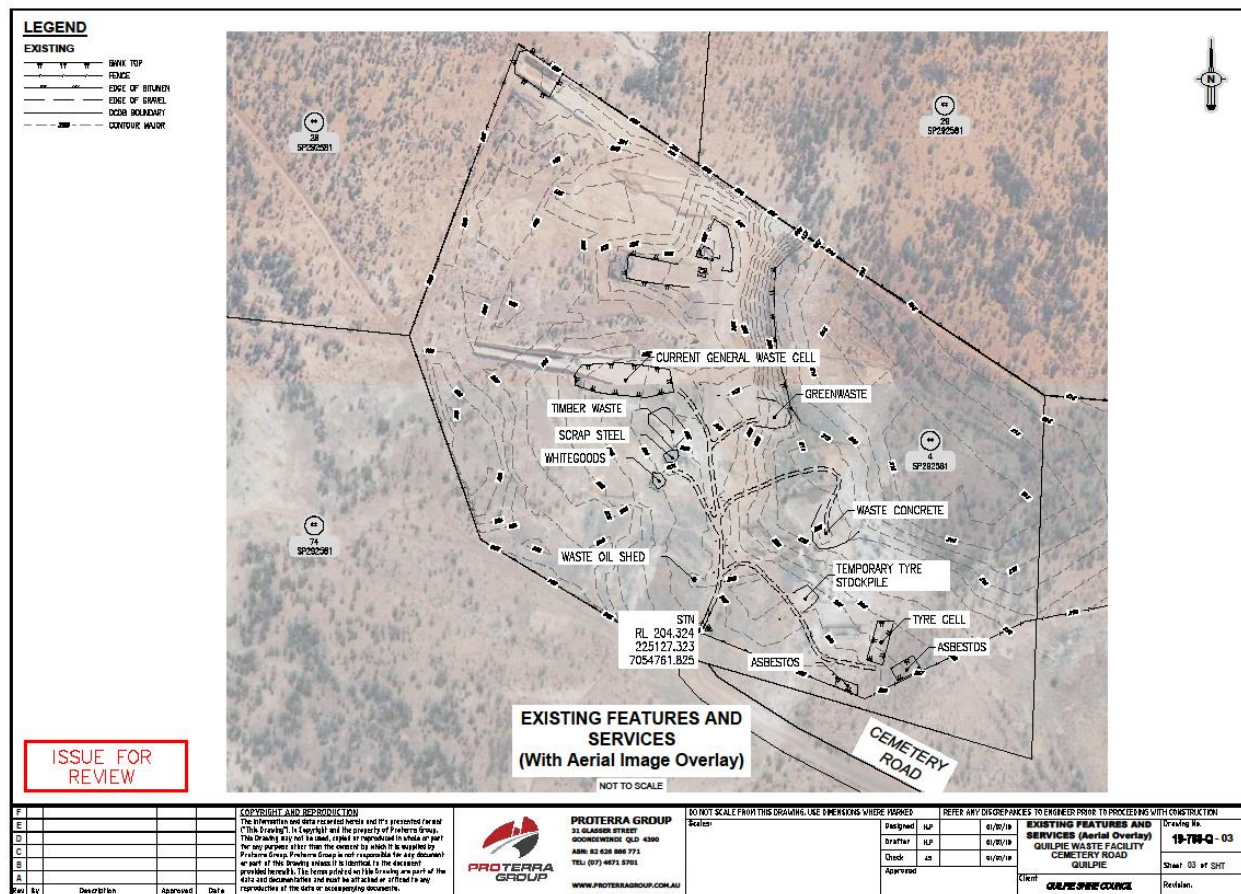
Existing Site Plan - Quilpie Waste Facility
